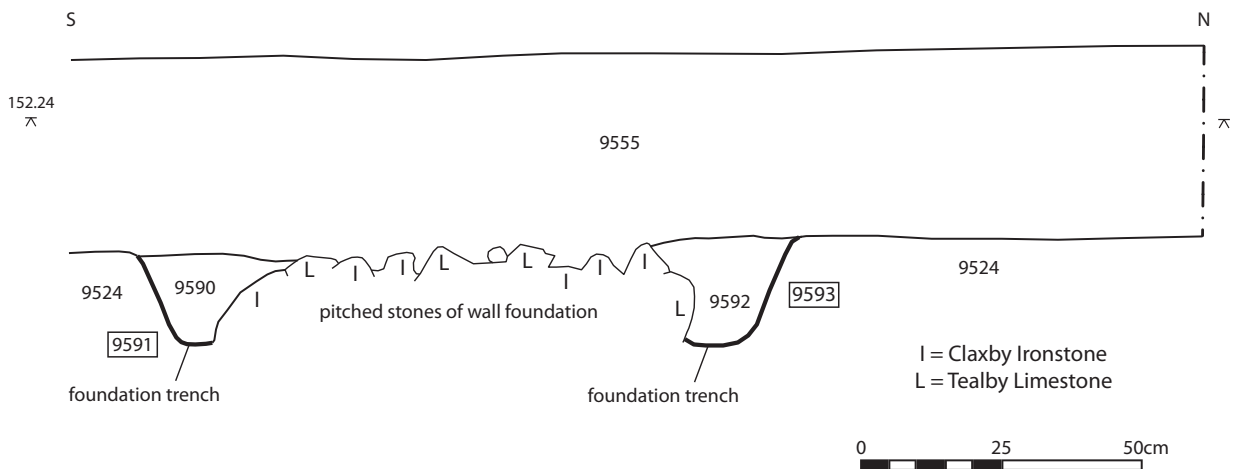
Trench J. Section through the stone foundation (9594) of the northern wall of Building 2 showing the construction cut [9591]/[9593].
